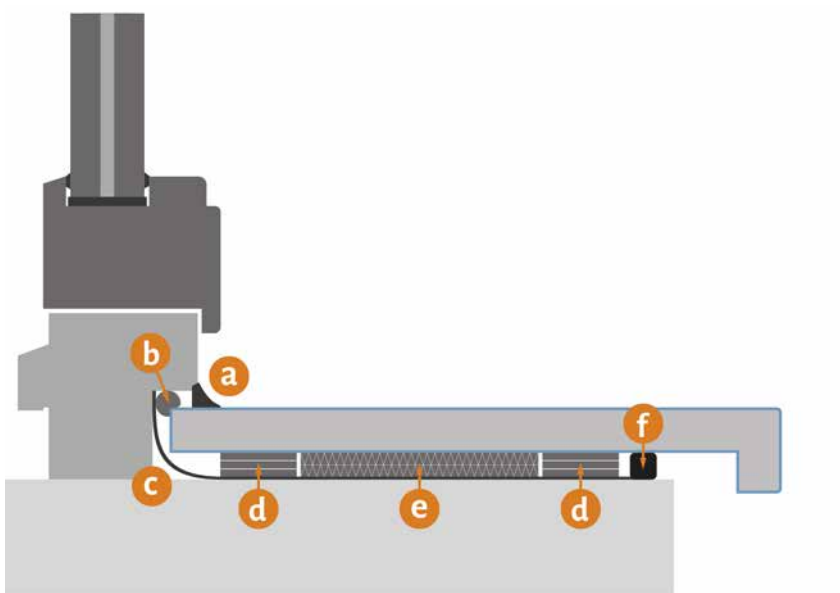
Schematic diagram of an installed window sill with vapour barrier
